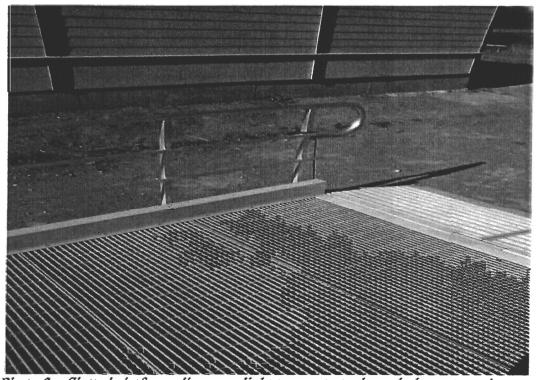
Slotted platform allows sunlight to penetrate through the water column as to not impact eelgrass beds below.
